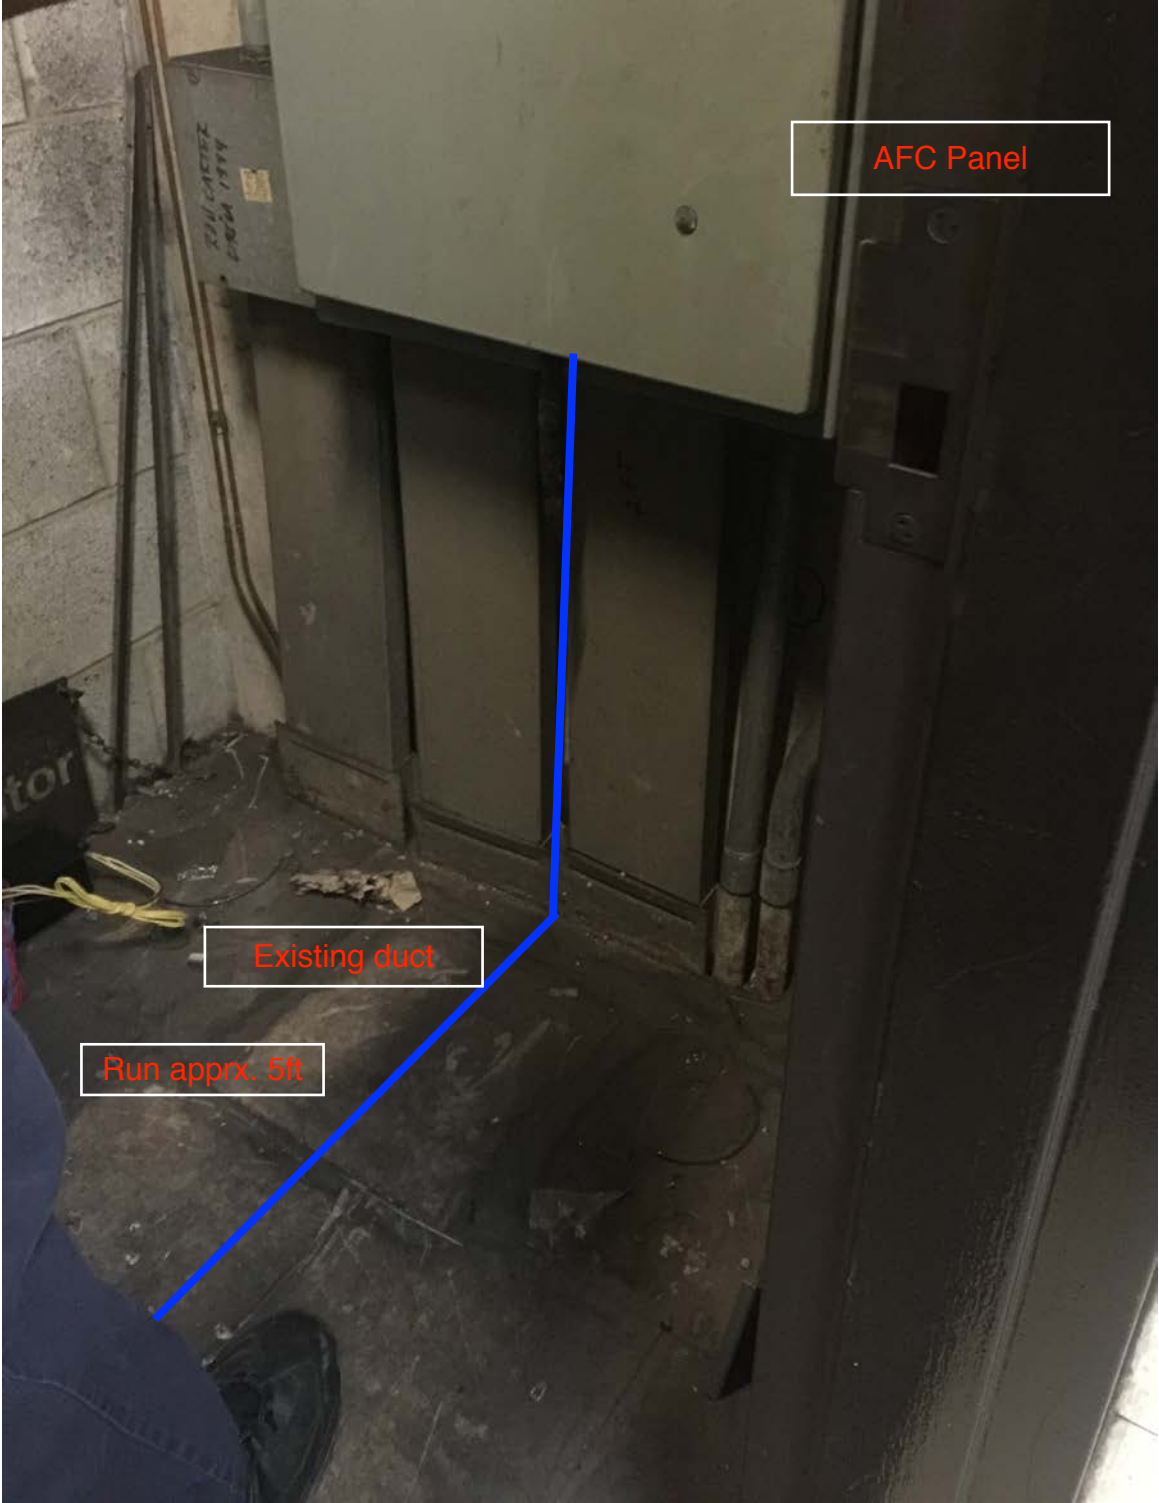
K01 Court House – Duct run from manhole 1 to manhole 2
